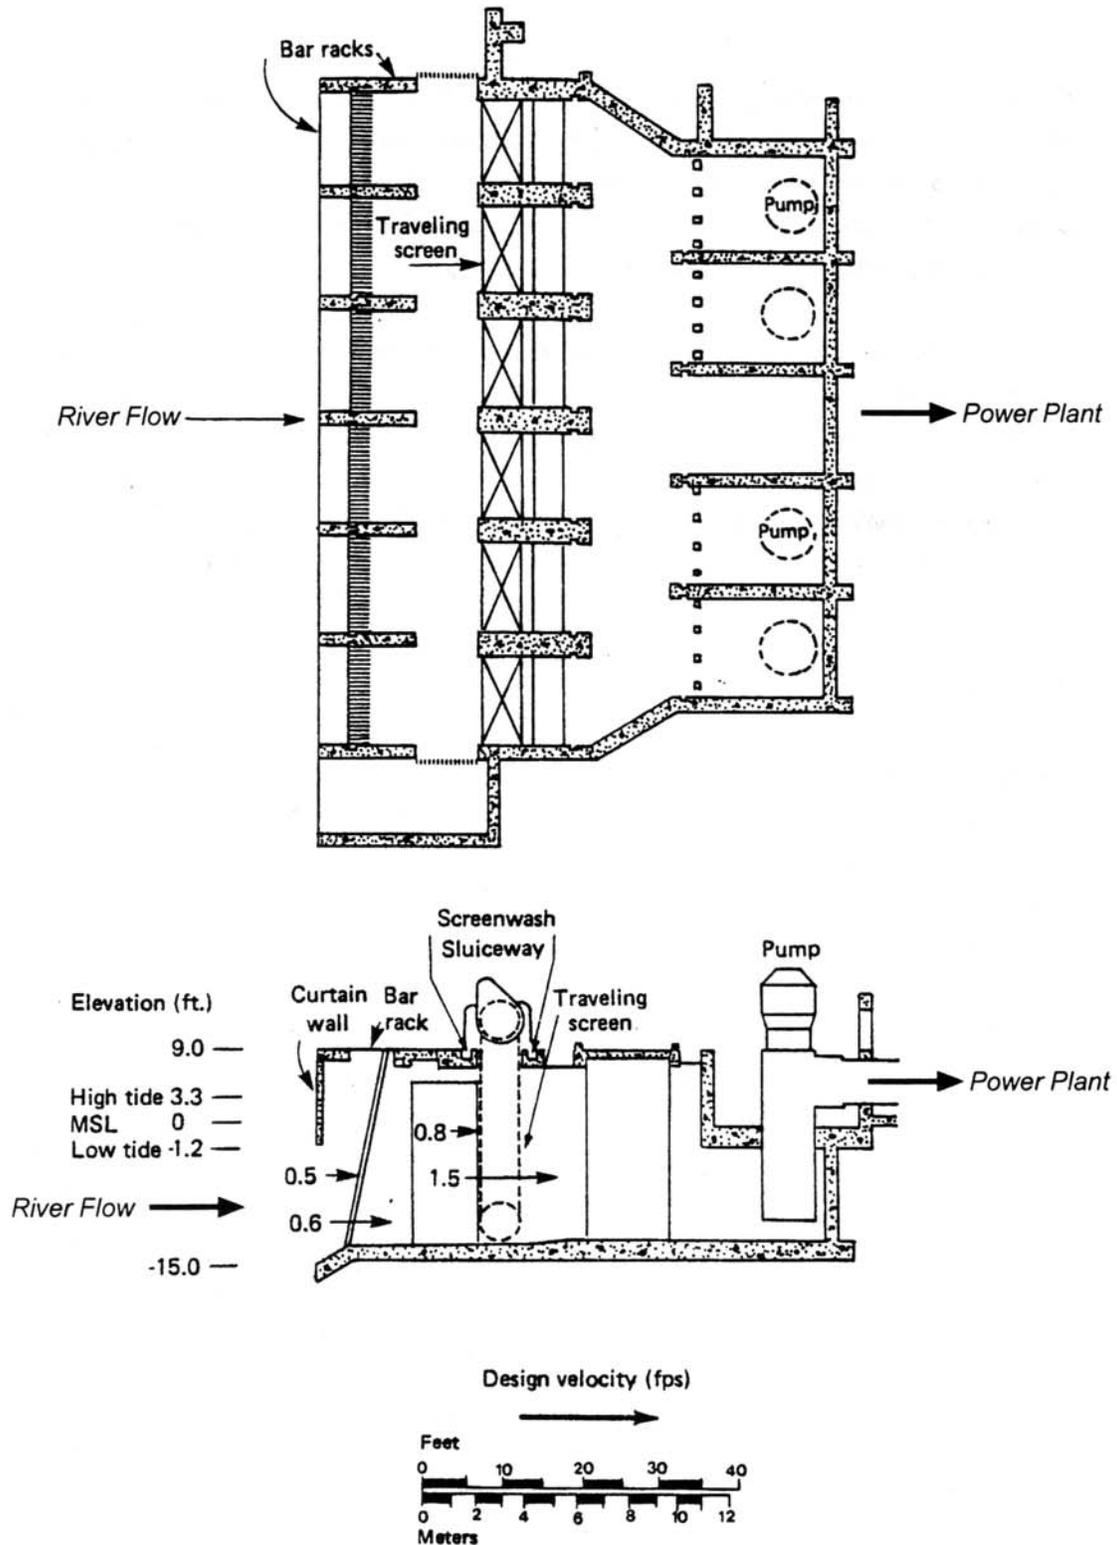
Plan and section schematic diagrams of Pittsburg Power Plant Units 5 & 6 intake structure. (PG&E)
